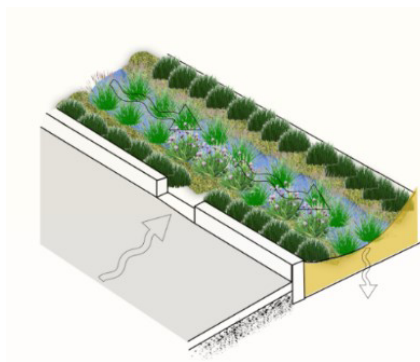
Sectional drawing of infiltration and circulation facility.
